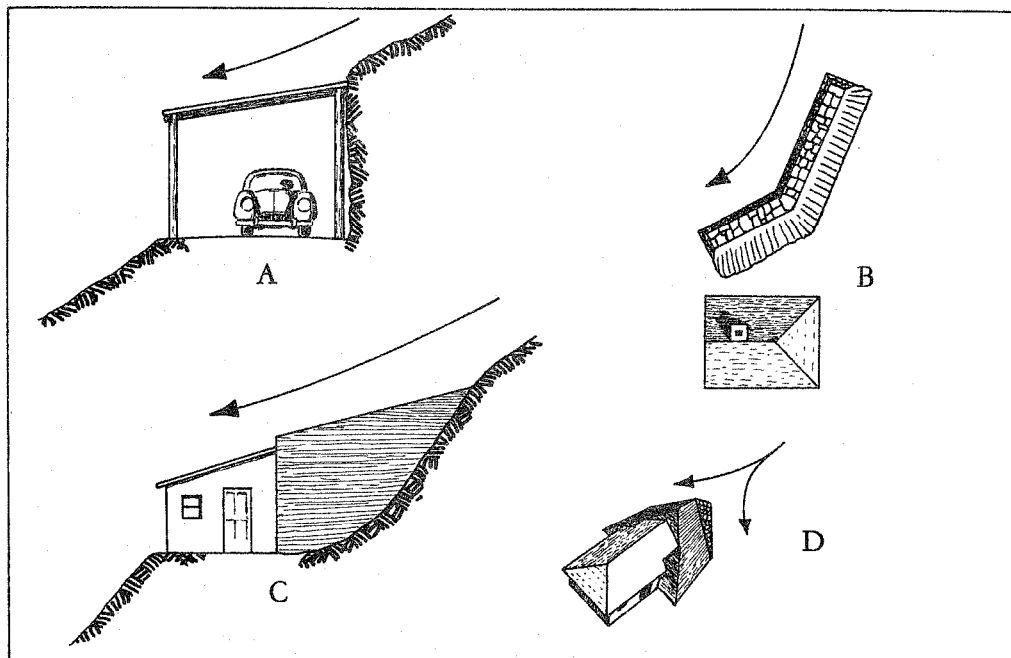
Other types of avalanche control structures. These are used primarily to protect isolated installations or buildings. A. Snowshed or galerie. B. Deflection wall. C. Ramp of earth. D. Bunker to split the avalanche.
